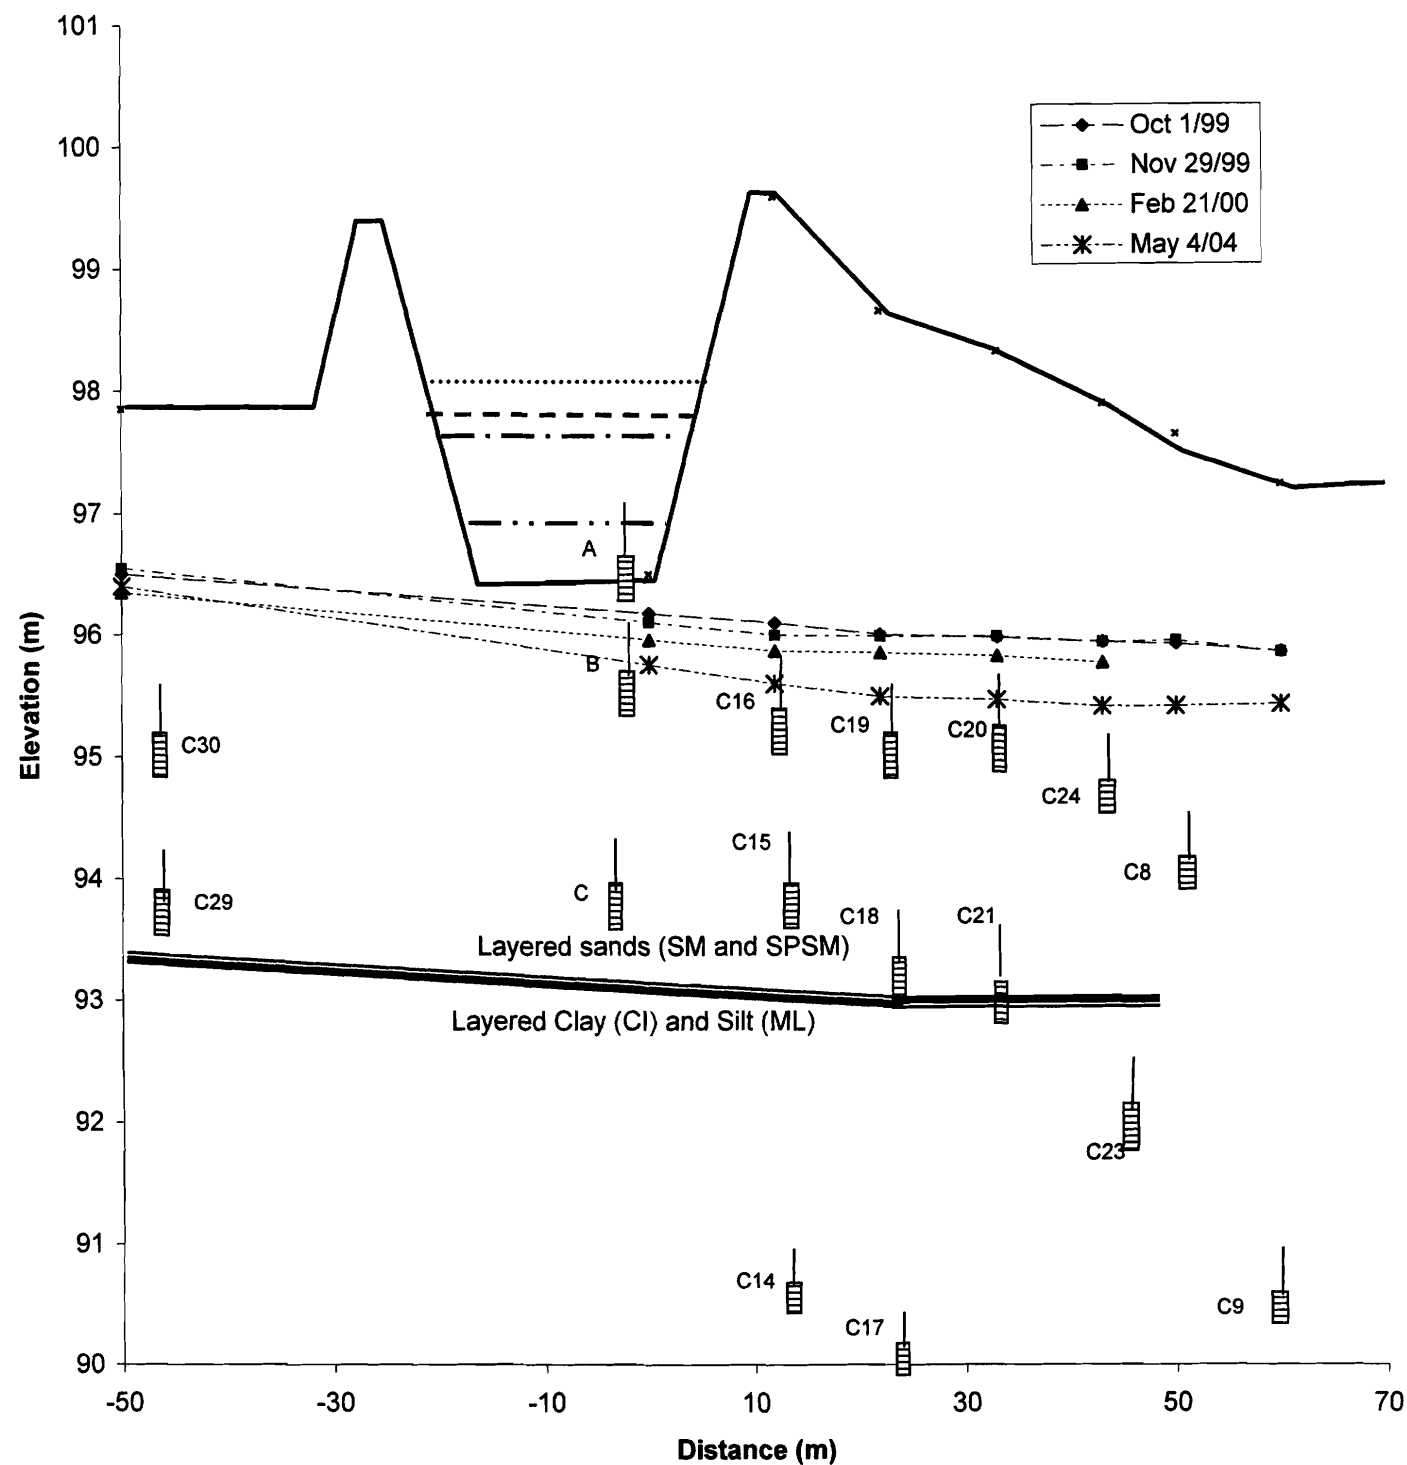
Site No. 1 groundwater elevations and locations of piezometer tips
